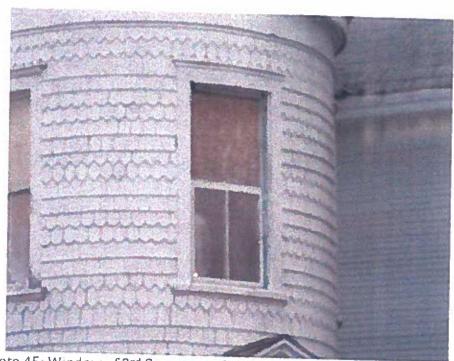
Window of 2nd floor turret facing northeast. Panes are broken and window is pain shut. May not operate.
